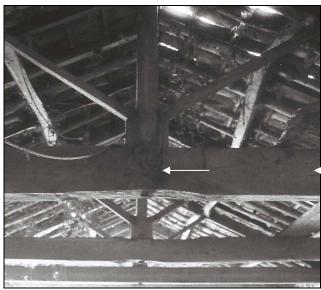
, 118: general view with the notched southern truss (Type 1, '1'), from the northeast
